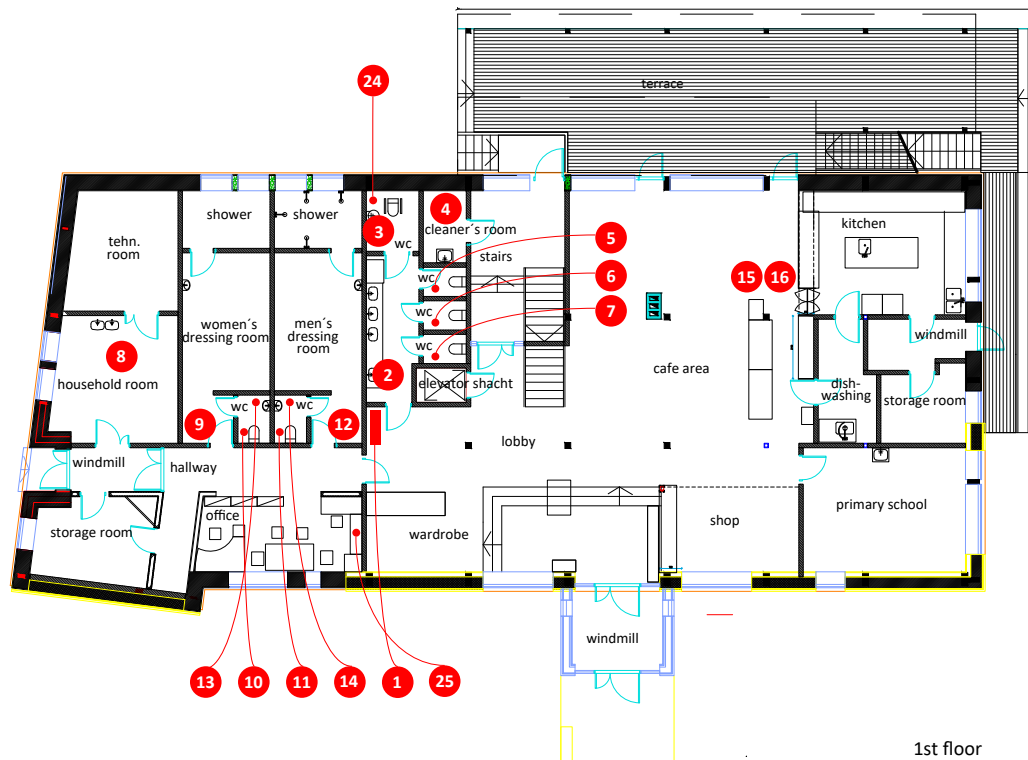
Waste bin setup on the first floor of the training center, in design proposal experiment.
